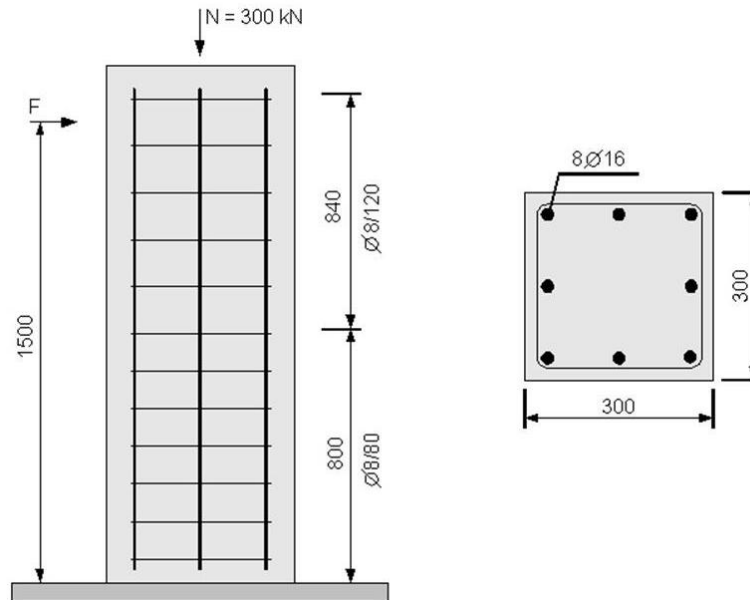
Geometry, cross-section and reinforcement of the RC column.
